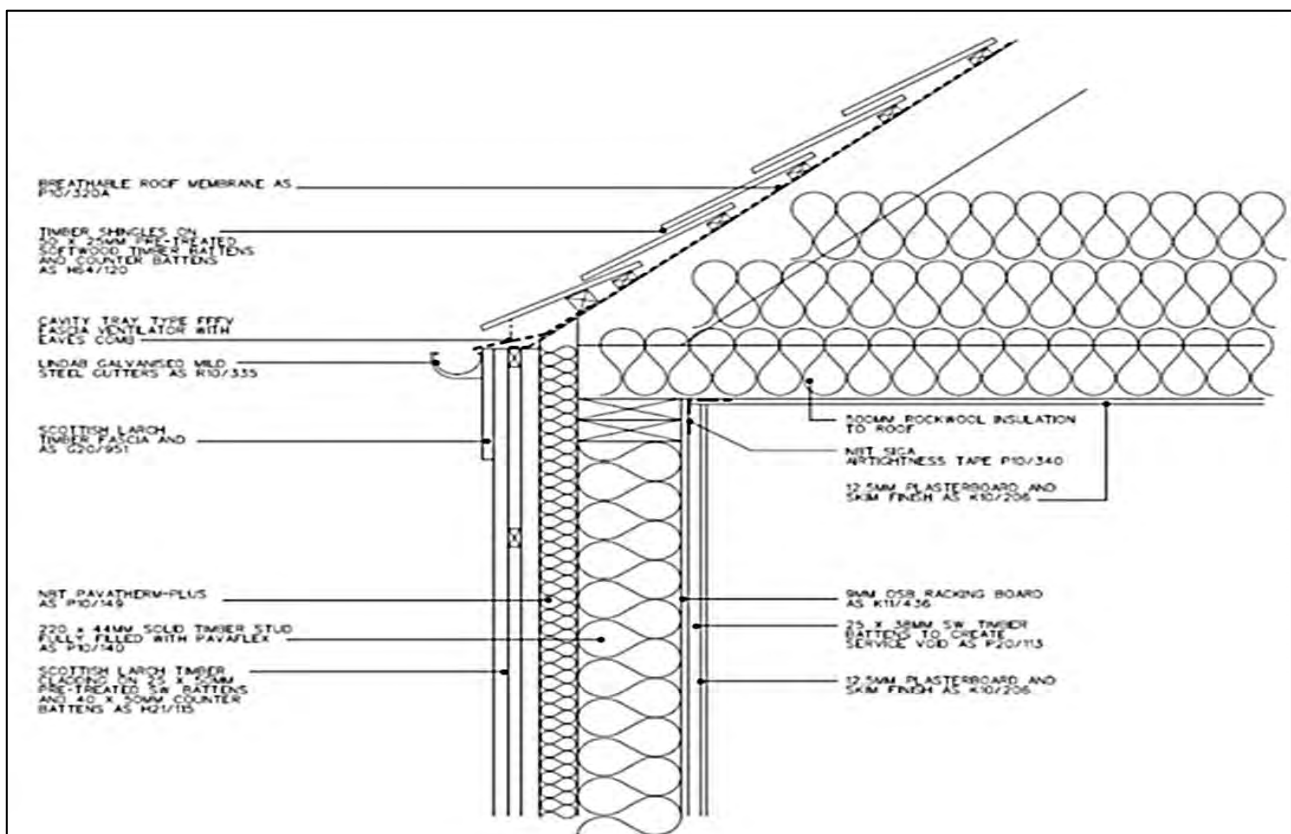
Construction Drawing, Apartment Eaves Detail (19 May 2011)
